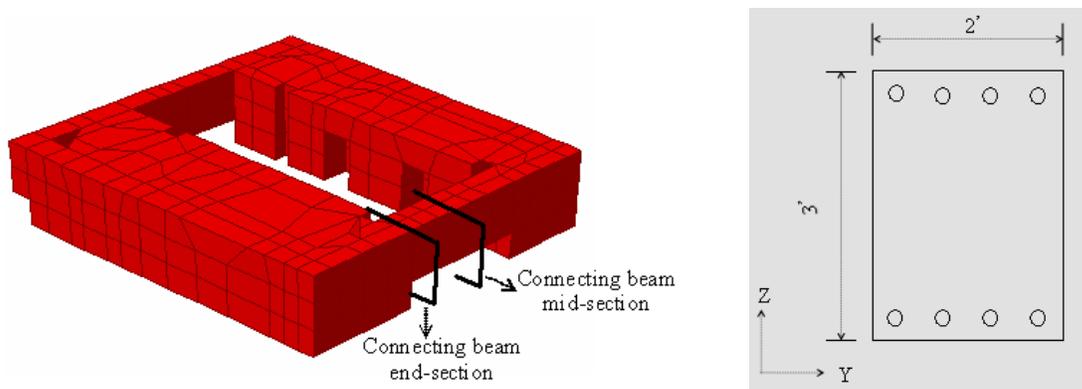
Sections chosen to assess the extent of damage for the connecting beam
